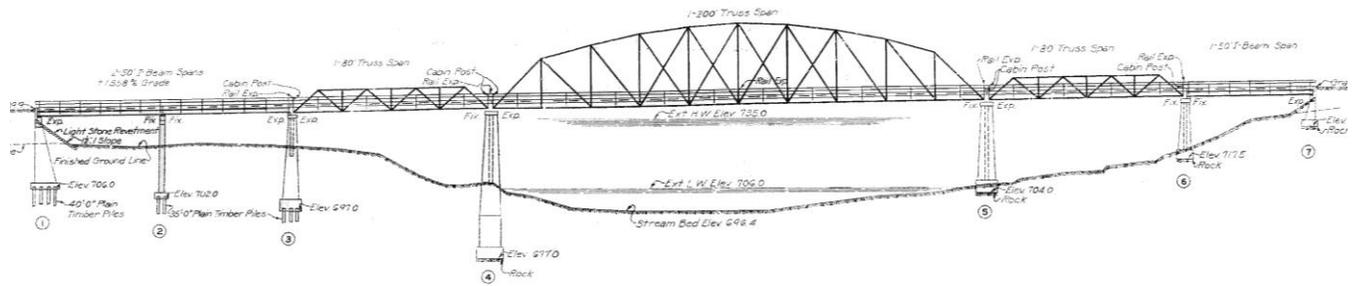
Bridge plan showing pier and bent numbers, spans are numbered from left to right
